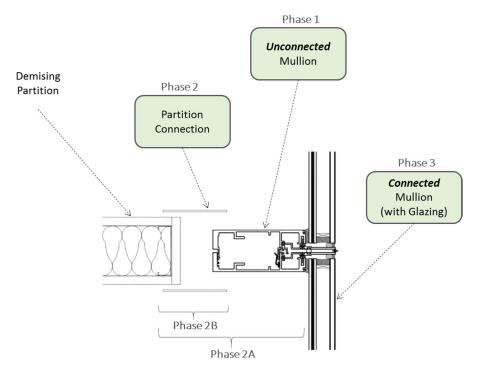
PLAN DIAGRAM OF THE EXPERIMENT TEST PHASES DEFINED BY THREE CURTAIN WALL SPECIMENS
